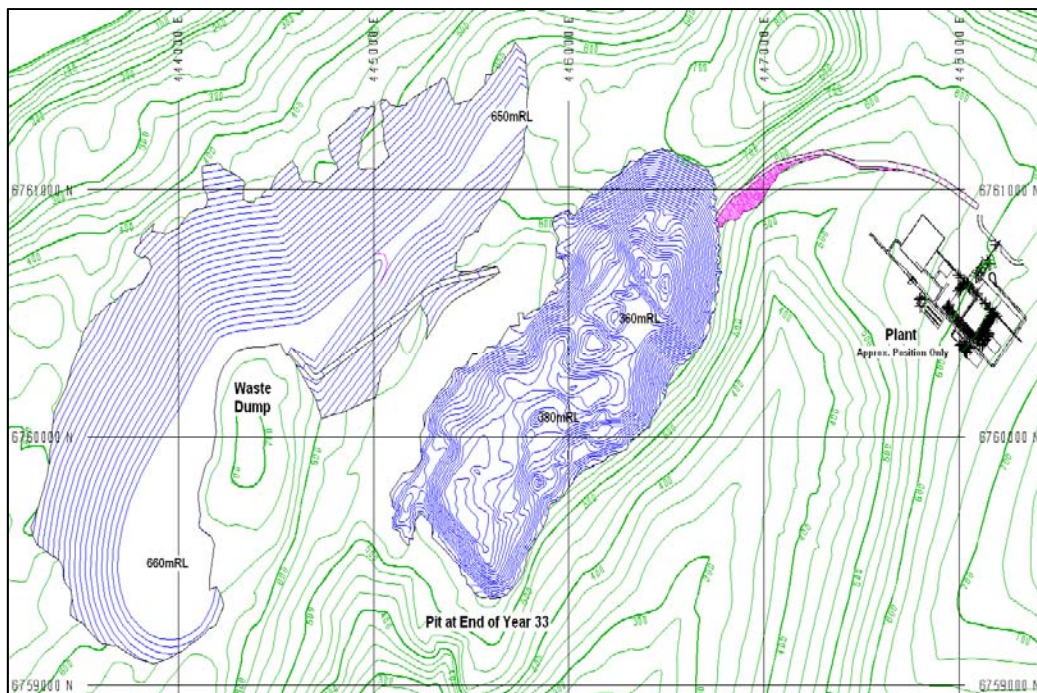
Overview – Final Pit and Waste Dump – Year 33
